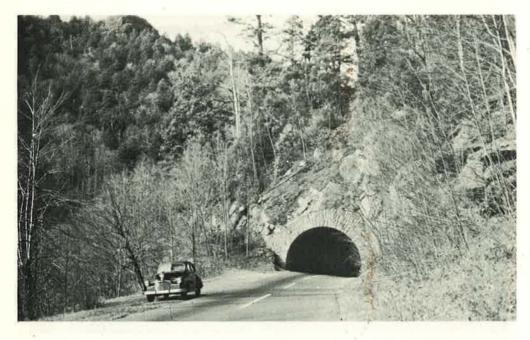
Severe Damage to the Landscape Can Sometimes be Avoided at Little Extra Cost by Tunnelling.
